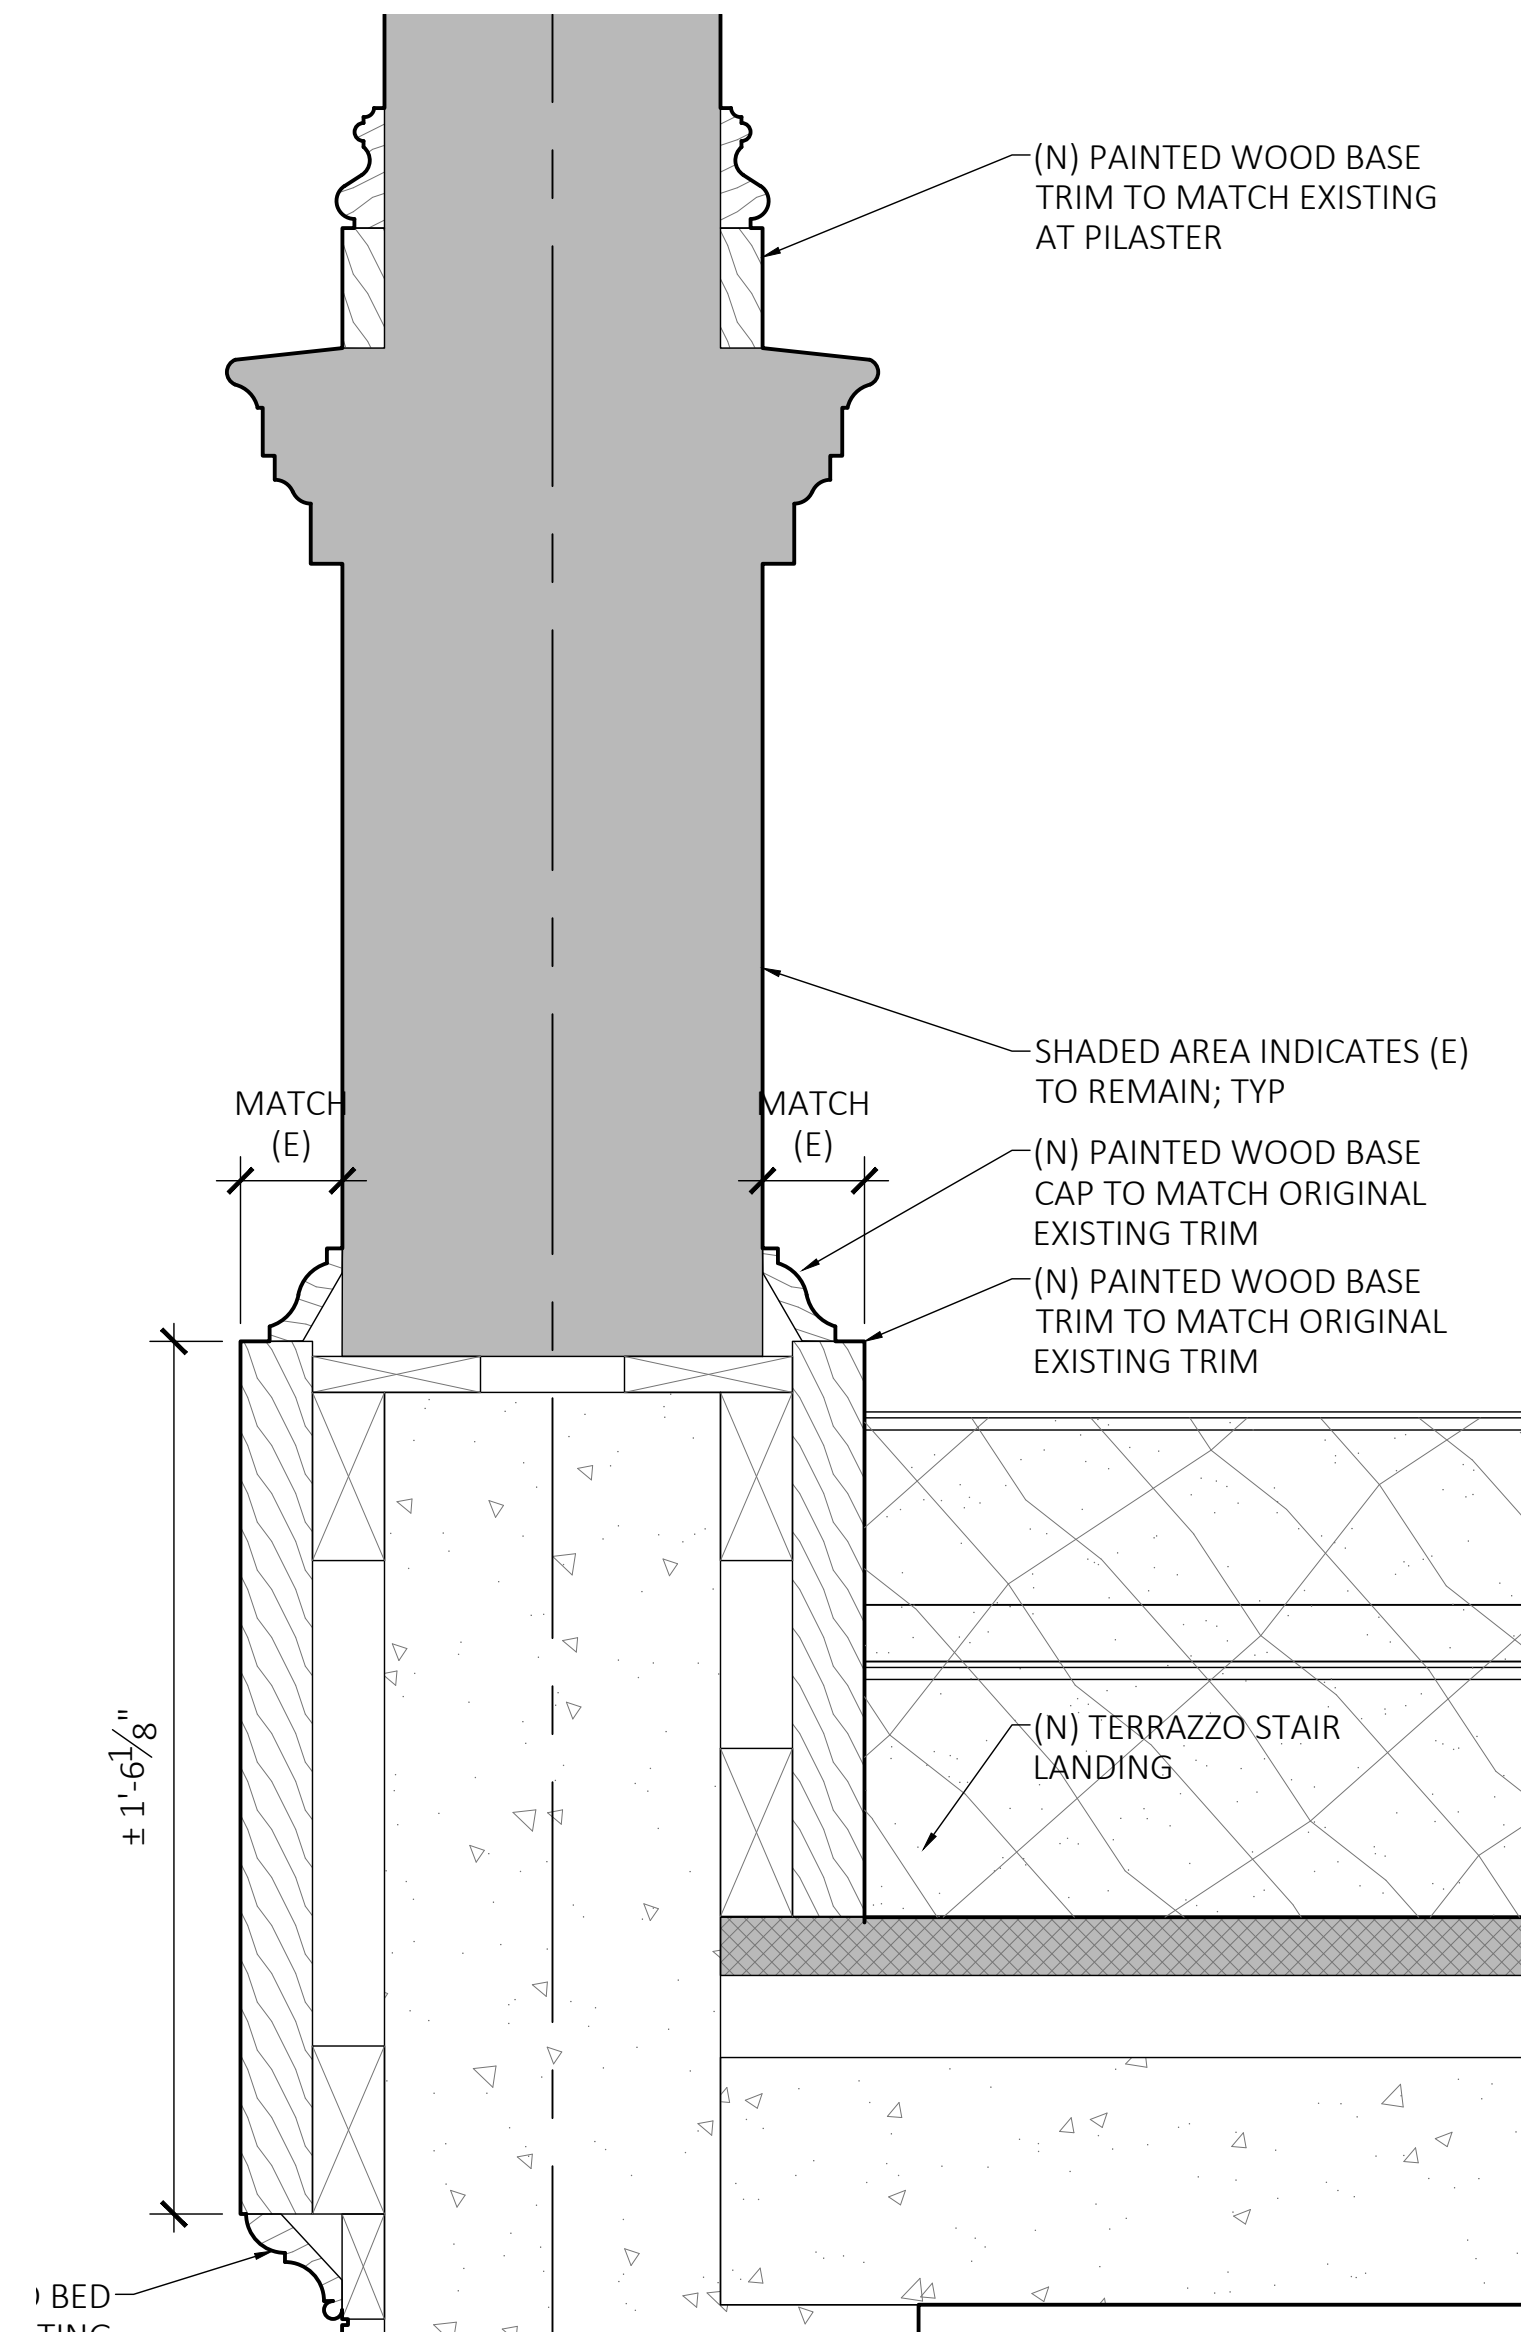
DETAIL AT STAIR TREAD/RISER - PROPOSED 7
